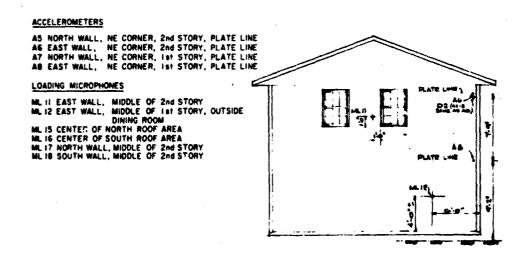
INSTRUMENTATION LOCATION, STRUCTURE E-2 ELEVATION
